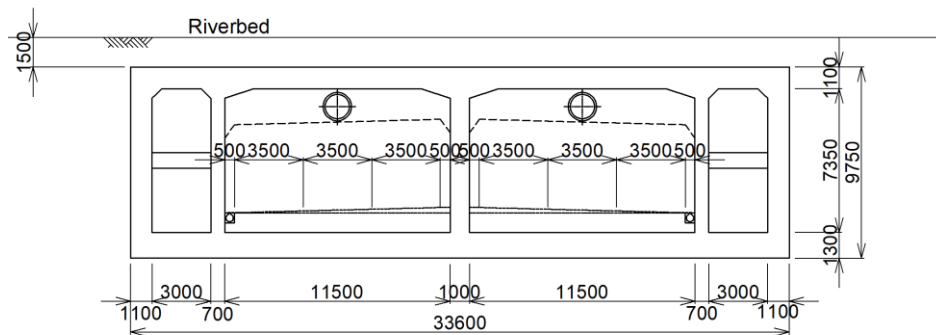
Profile of Submerged Tunnel and Shield Tunnel
